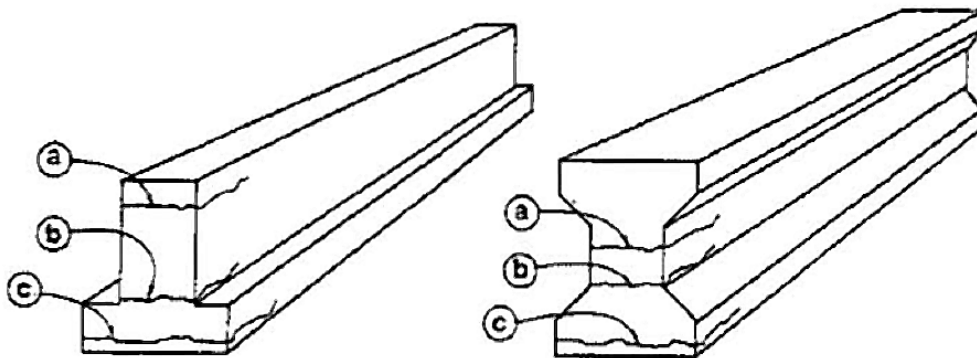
Common cracks in pretensioned beams (PCI, 1985)
